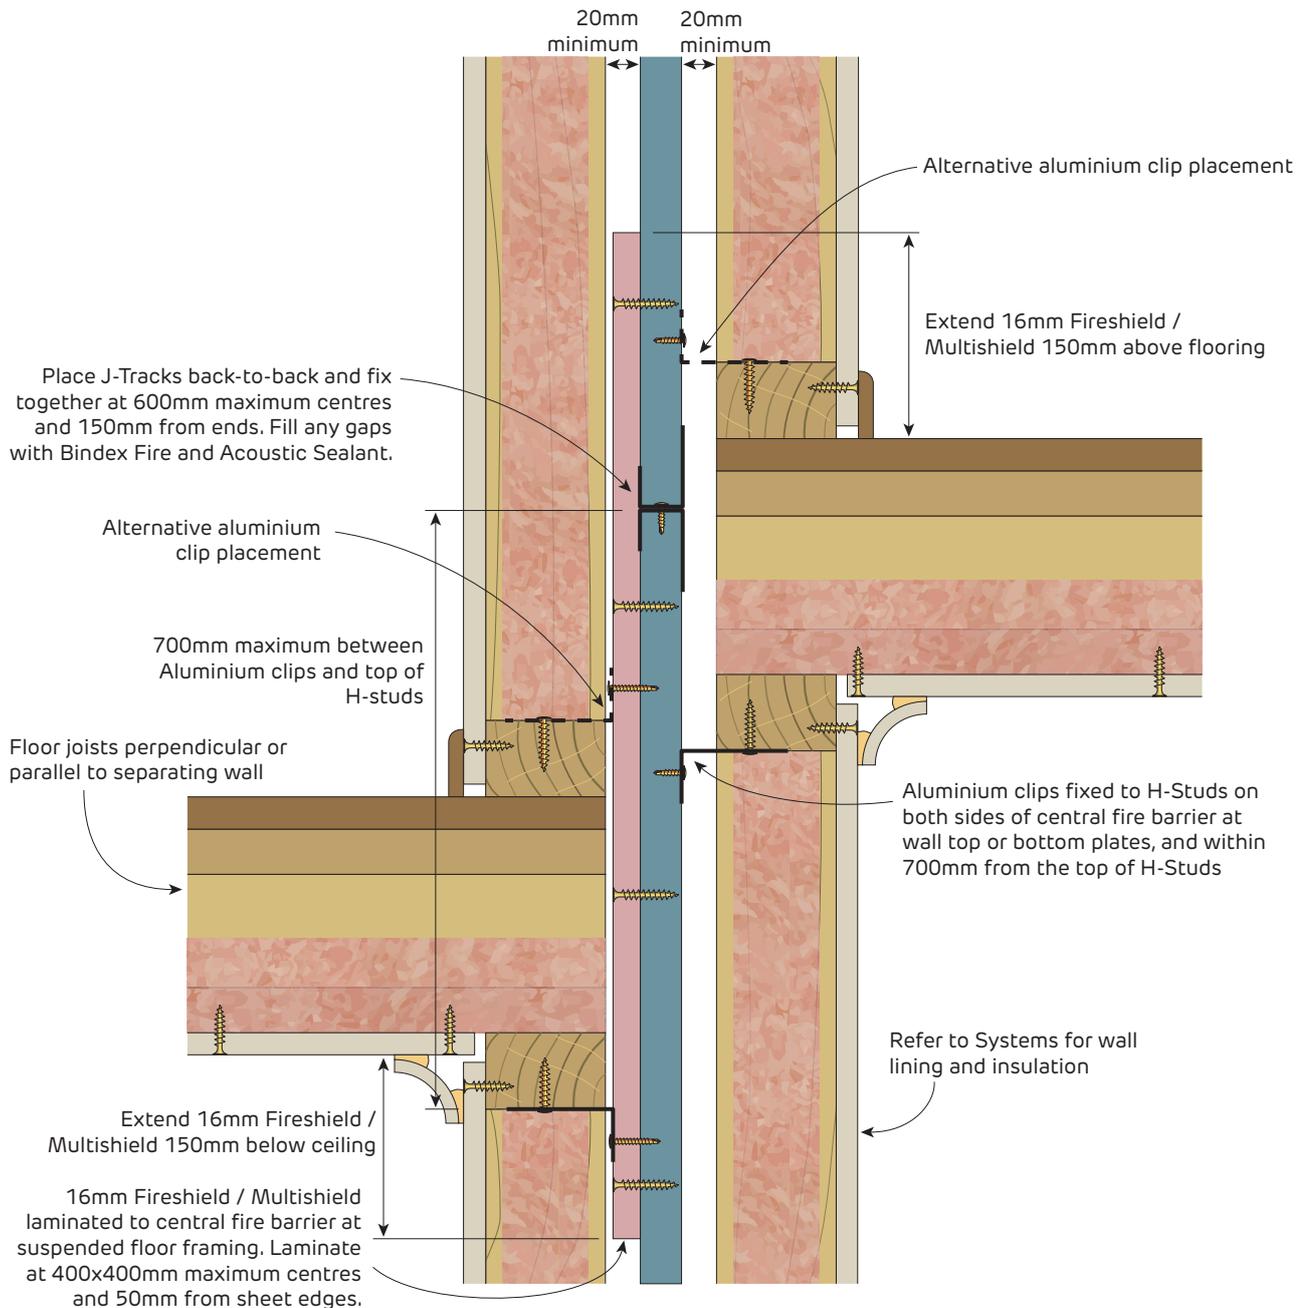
Interhome Wall to Upper Storey Staggered Floor
